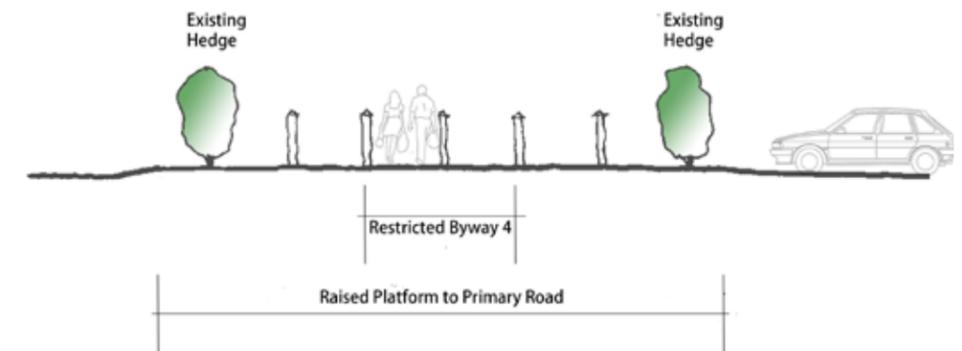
Street Section GG - Restricted Byway 4/ Primary Road Crossing
